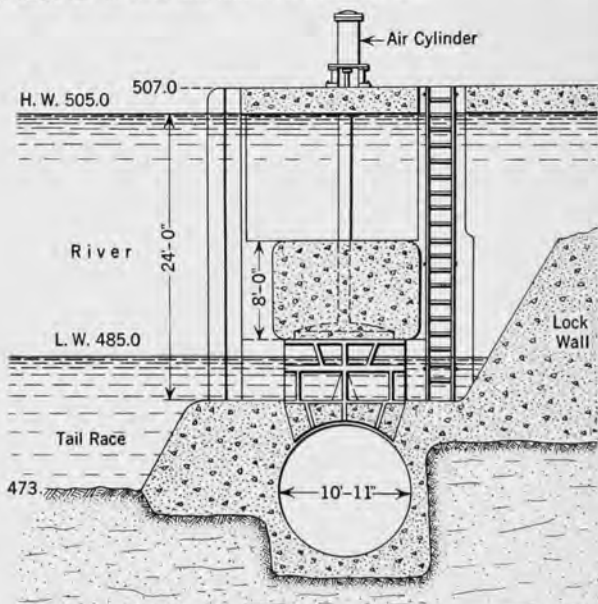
KEOKUK LOCK; DISCHARGE VALVE AND ITS RELATION TO OTHER PARTS OF SYSTEM.
